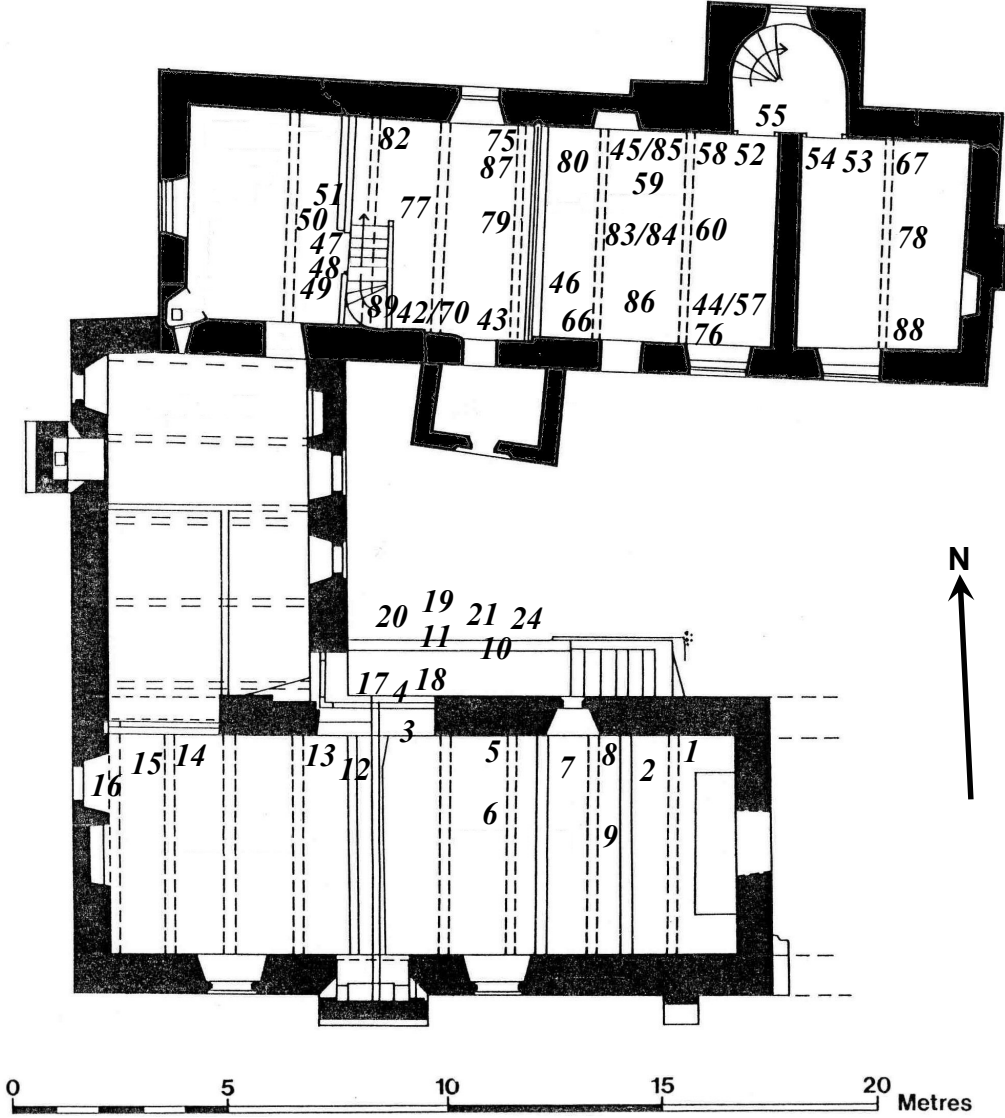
Plan of the ground floor showing, where possible, the approximate location of the samples (after Morley 1983, Fig 4)
